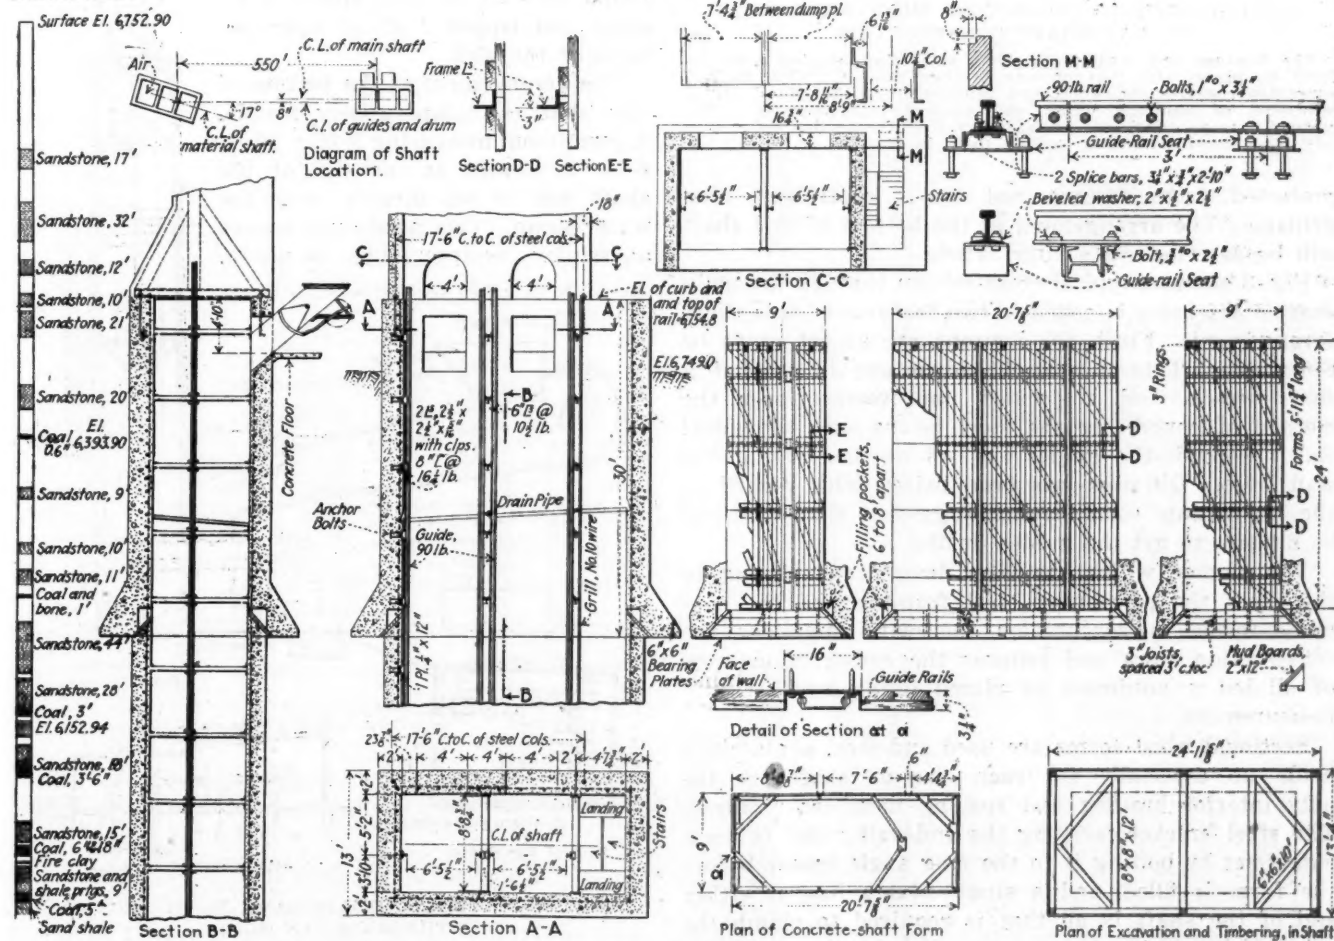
CONSTRUCTION PLAN OF THE MAIN SHAFT WITH DETAILS OF GUIDES, BUNTONS AND CONCRETE FORMS
